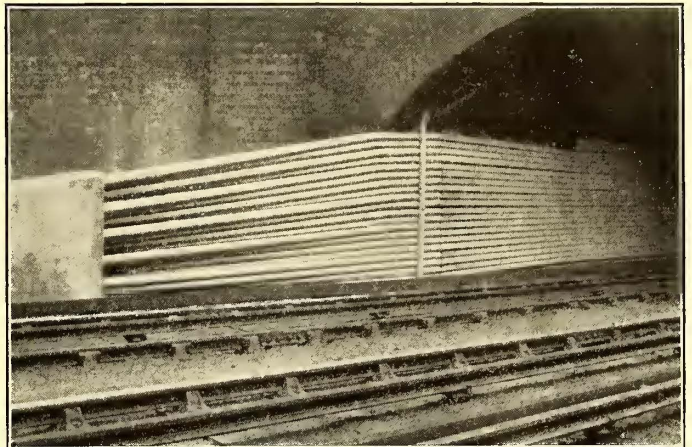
CABLE TROUGHING CONSTRUCTION UNDER HIGH STREET BRIDGE, WEST END
